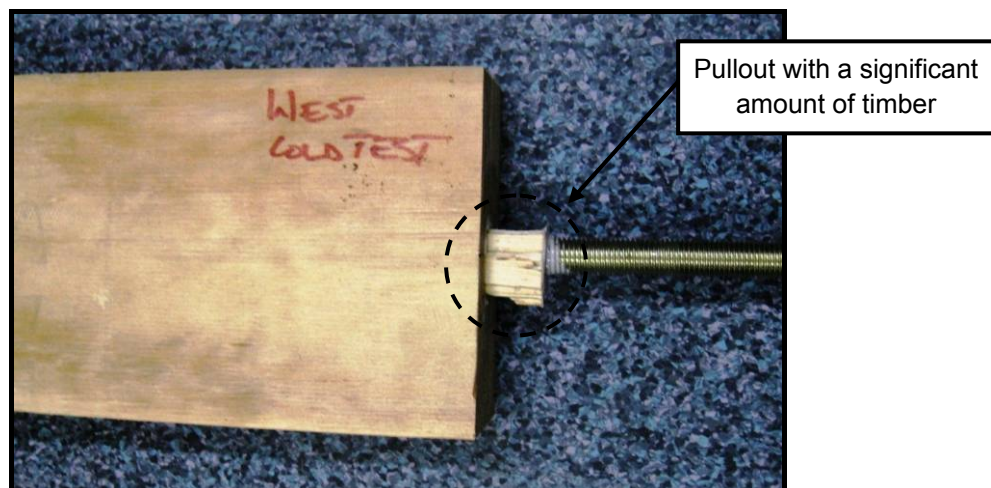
Mode 2 Failure in Timberlinx Specimen
